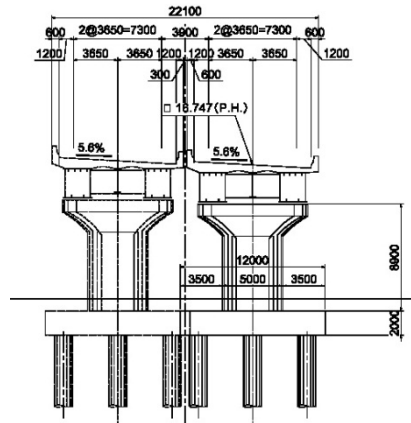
shows the cantilever type piers for supporting the flyover superstructures.
